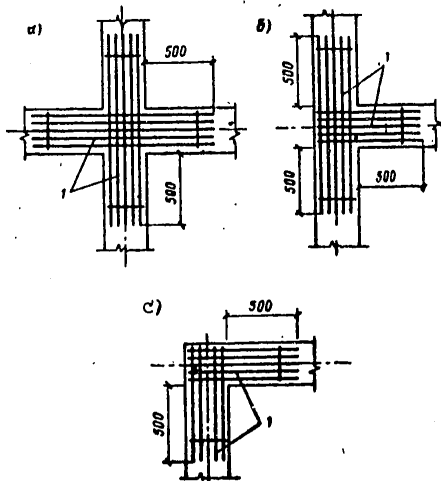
Structural reinforcement of masonry walls with 6-8 mm reinforcing mesh
